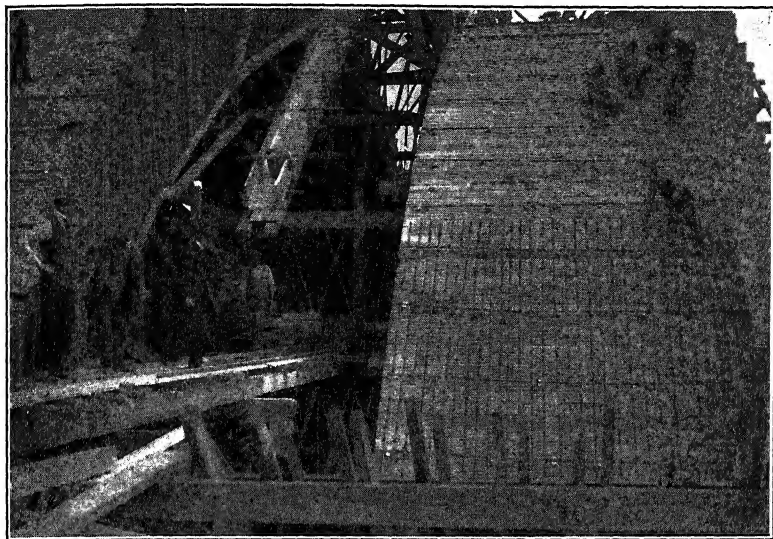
Arch reinforcement held in place by being wired to transverse timbers supported above the surface of the finished concrete. Bridge of Luten Design.
